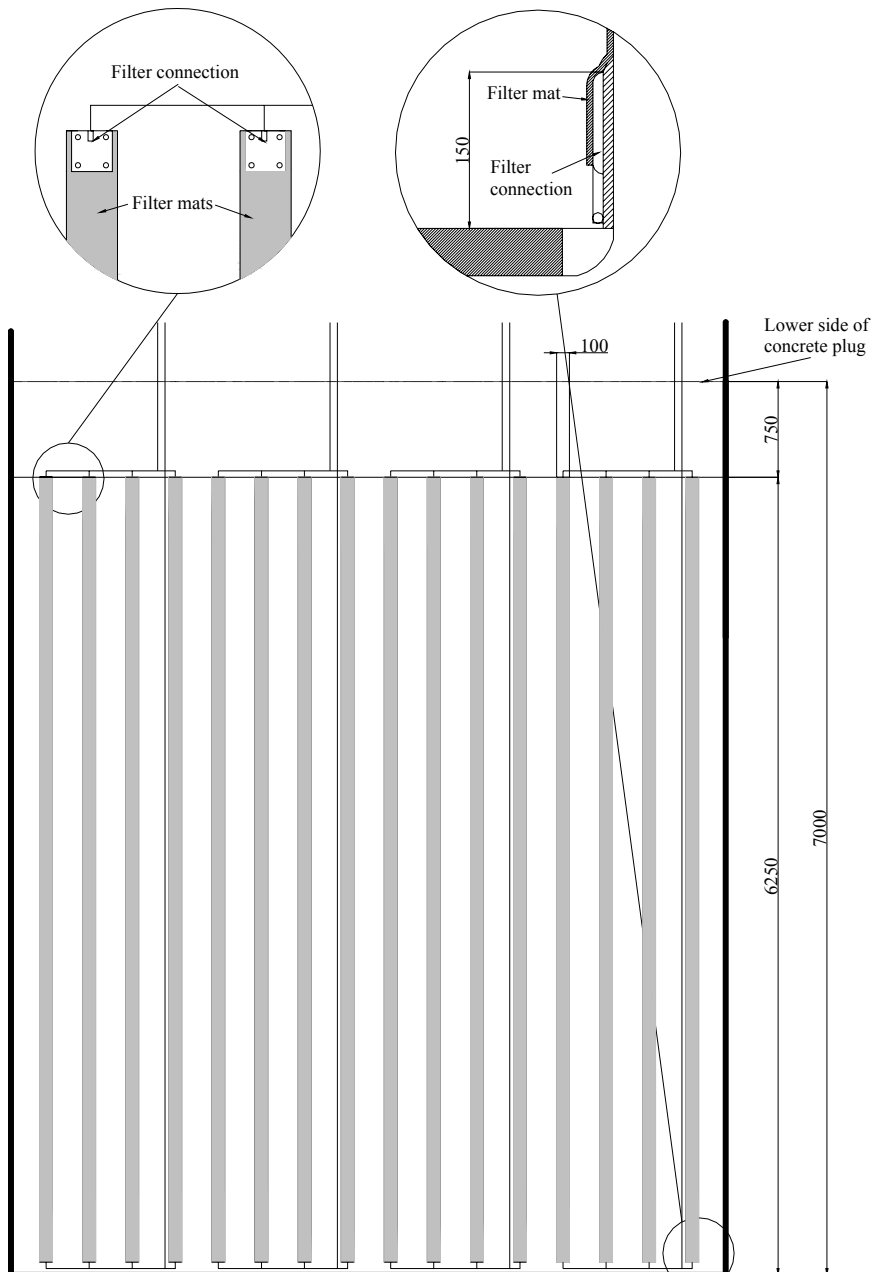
Schematic drawing of the location of the filter strips and connecting tubes in the wetting system. The surface of the deposition hole has been unfolded.
